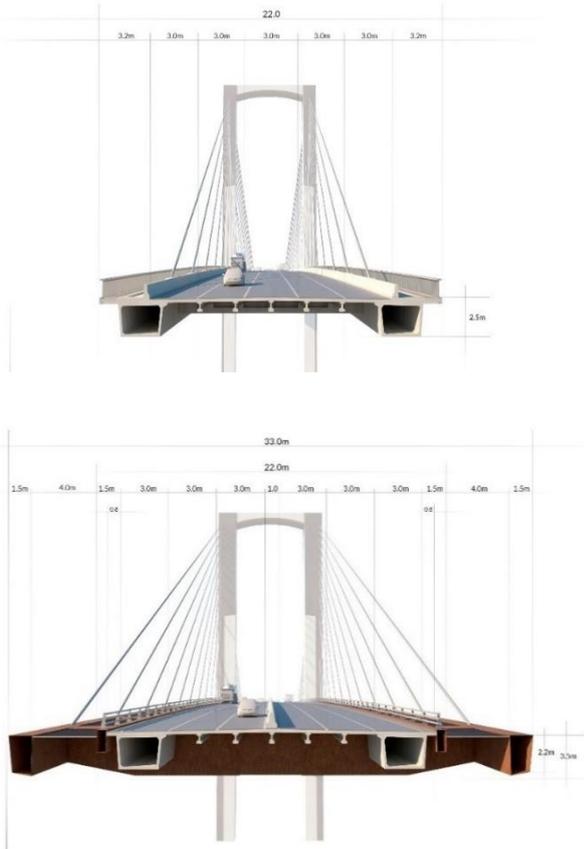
Current cross-section and Cross-section after the replacement of the stay-cables (6 lanes)
